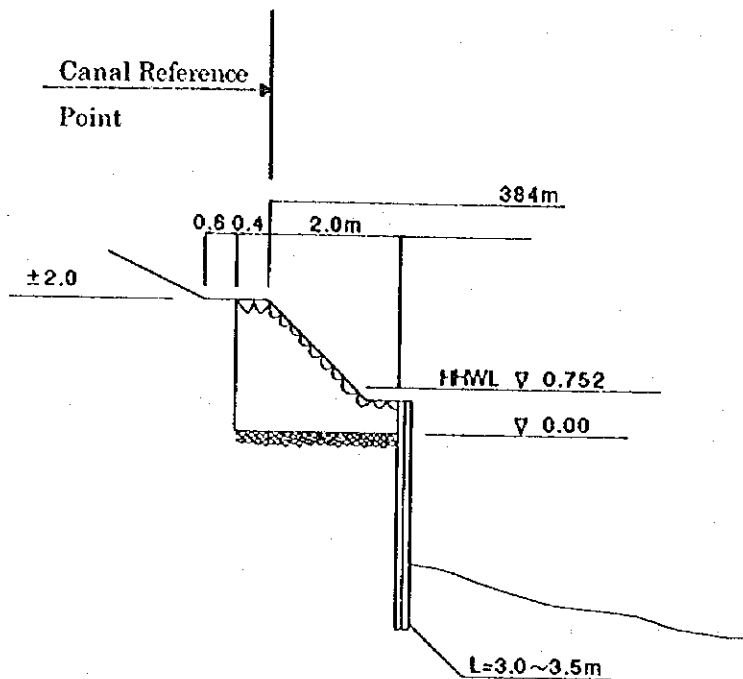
Retaining Wall of the Suez Canal at Qantara
